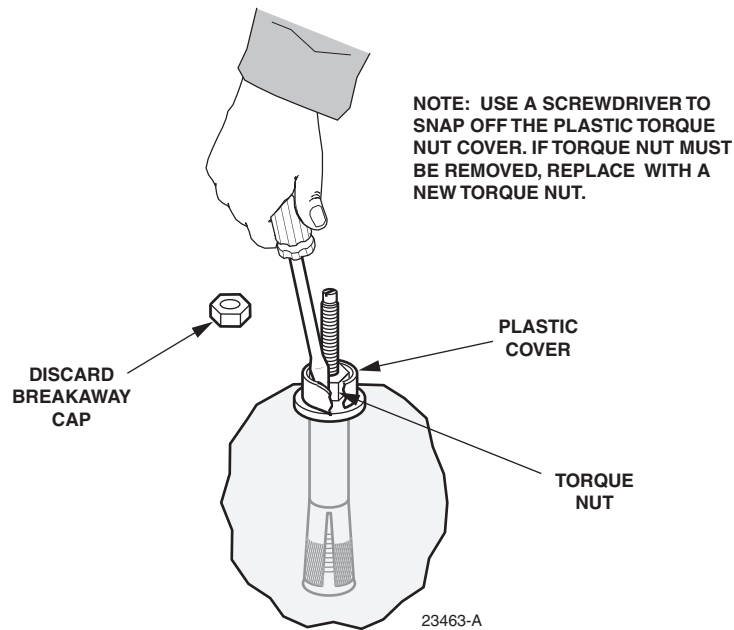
Installing Rack Shims and Anchoring Hardware
